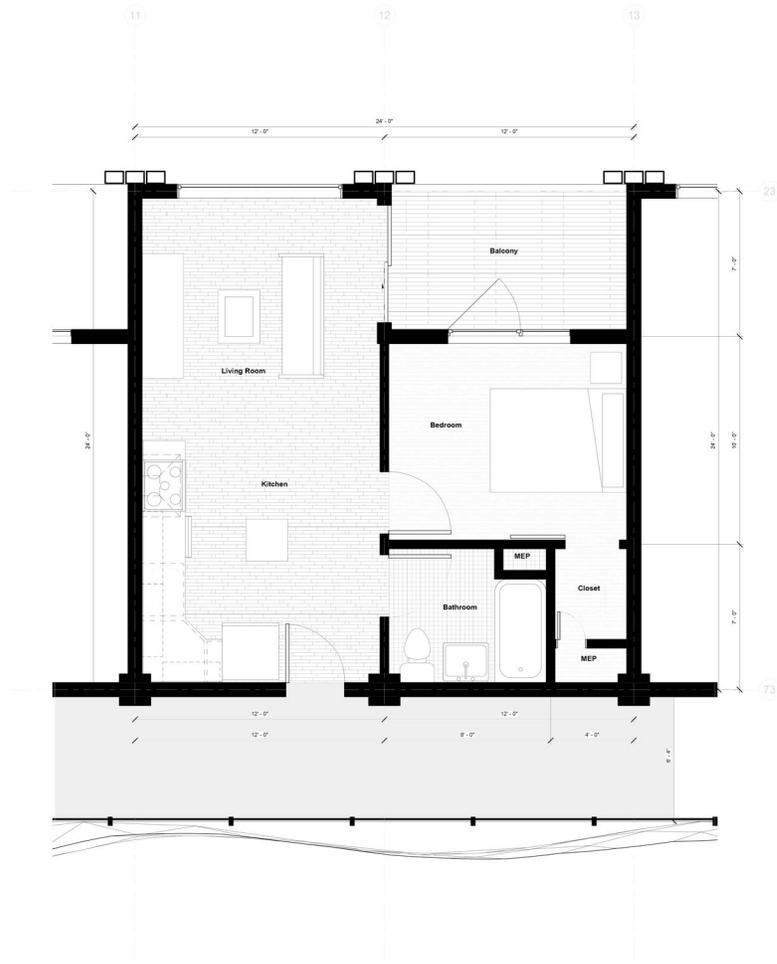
4th through 8th floor typical one bedroom unit floor plan
